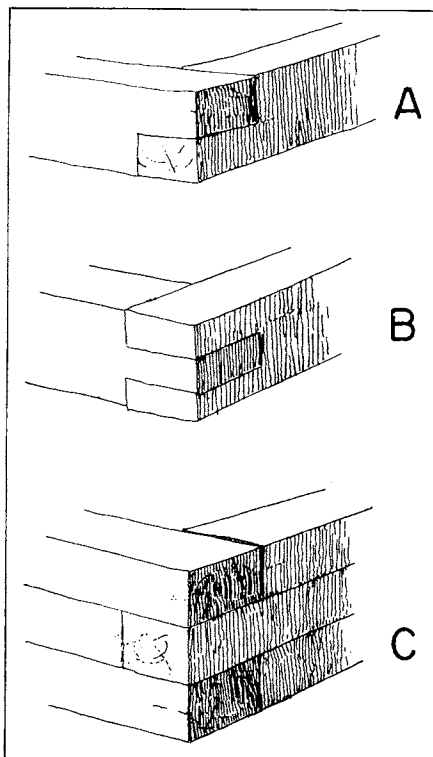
False corner-timbering. A, lap or rebated joint; B, tongue and groove; C, butt joint.
